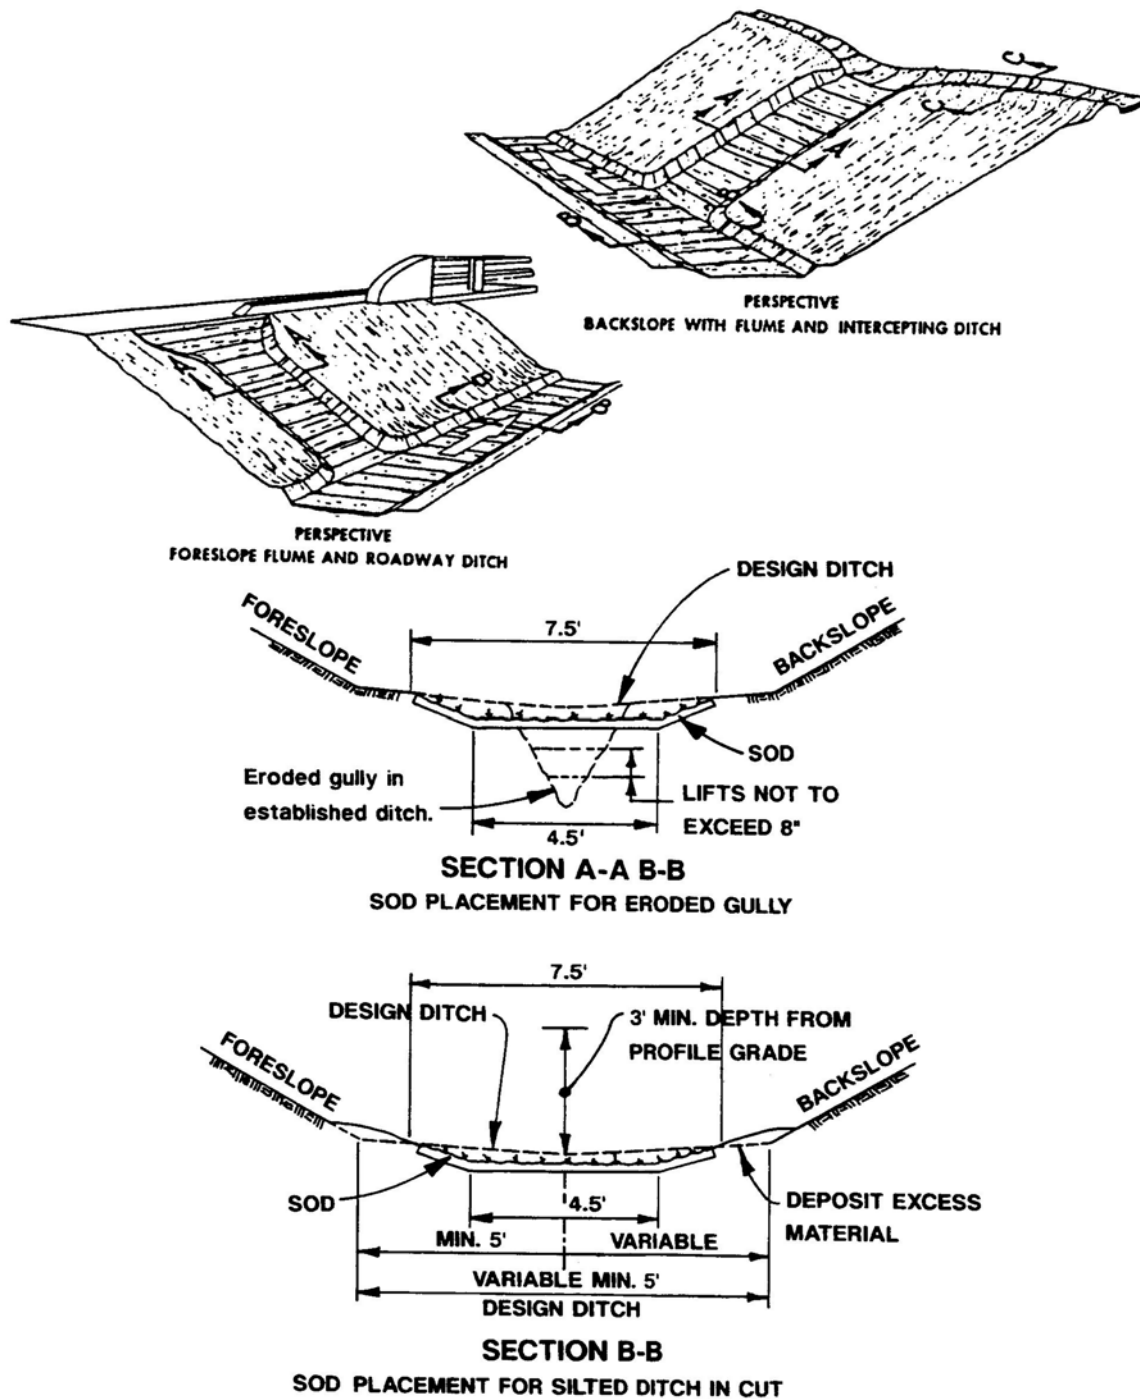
Sod placement in eroded gully and silted ditch (Source: Department of Civil, Construction, and Environmental Engineering, Iowa State University)
